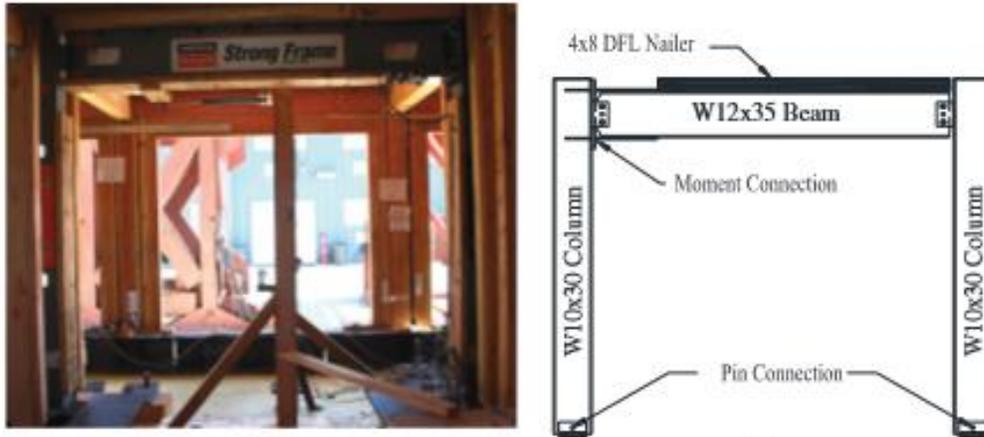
5: SMF (FEMA P-807) retrofit installation and its elevation (Bahmani et al., 2014)
